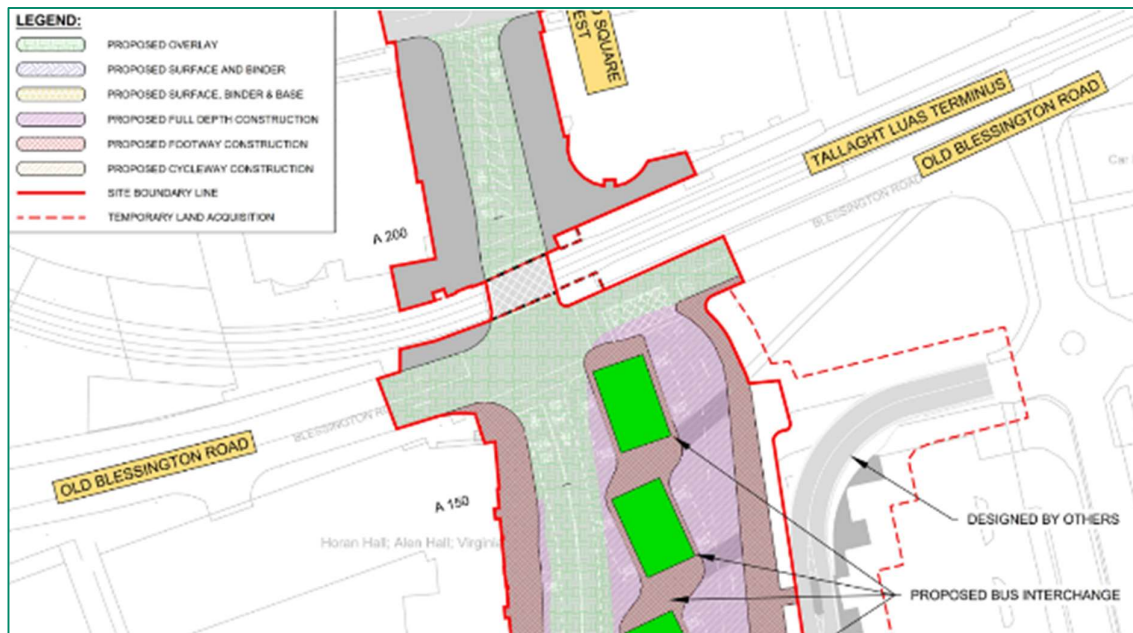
Extract of Pavement Treatment Drawings at Luas Red line / Old Blessington Road
